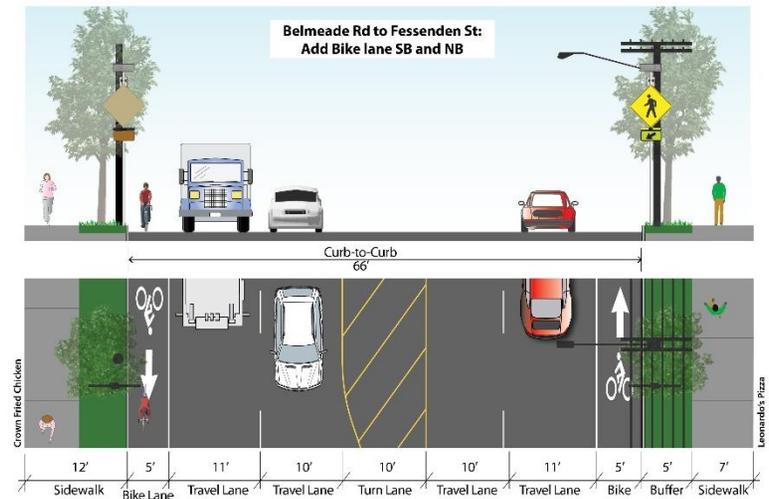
Alternative 1 – Fessenden Street to Belmeade Road
